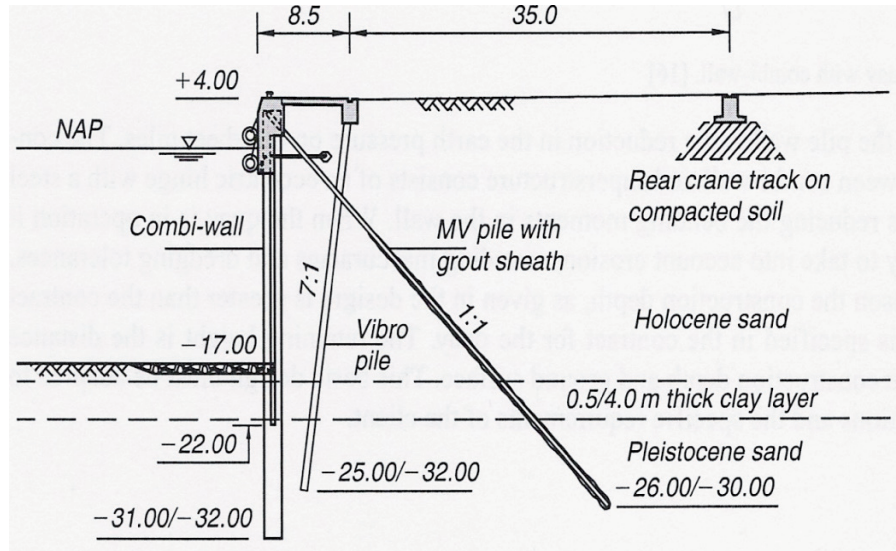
Cross-section of quay wall Amazonehaven Rotterdam 1992
